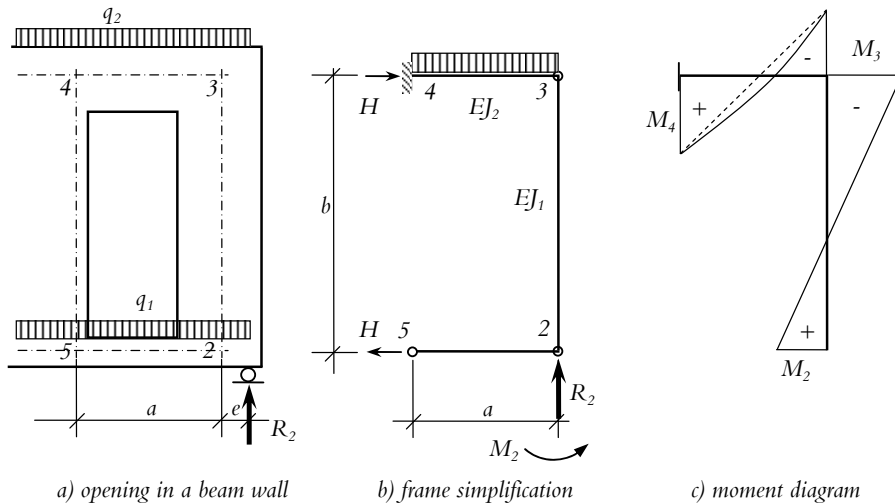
Methodology used in Betonghandboken for designing openings in wall (after Betonghandbok, 1997)
